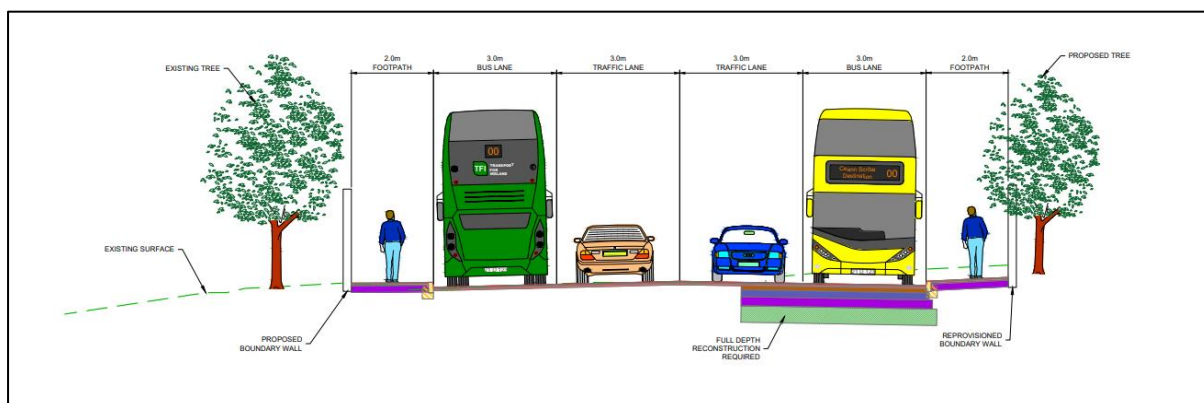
Extract from Typical Cross-section at Dublin Road (Sheet 18)
